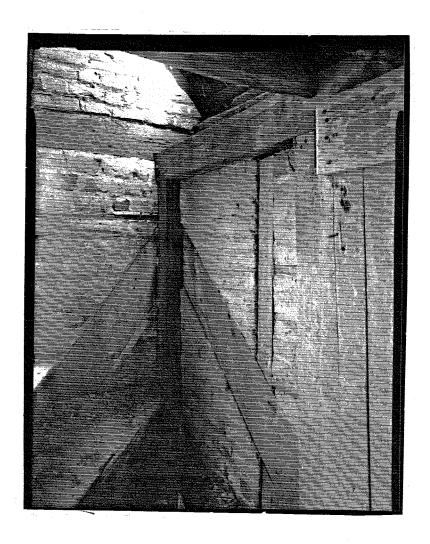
Hermitage Quarter, detail of corner bracing in staircase looking southwest.
